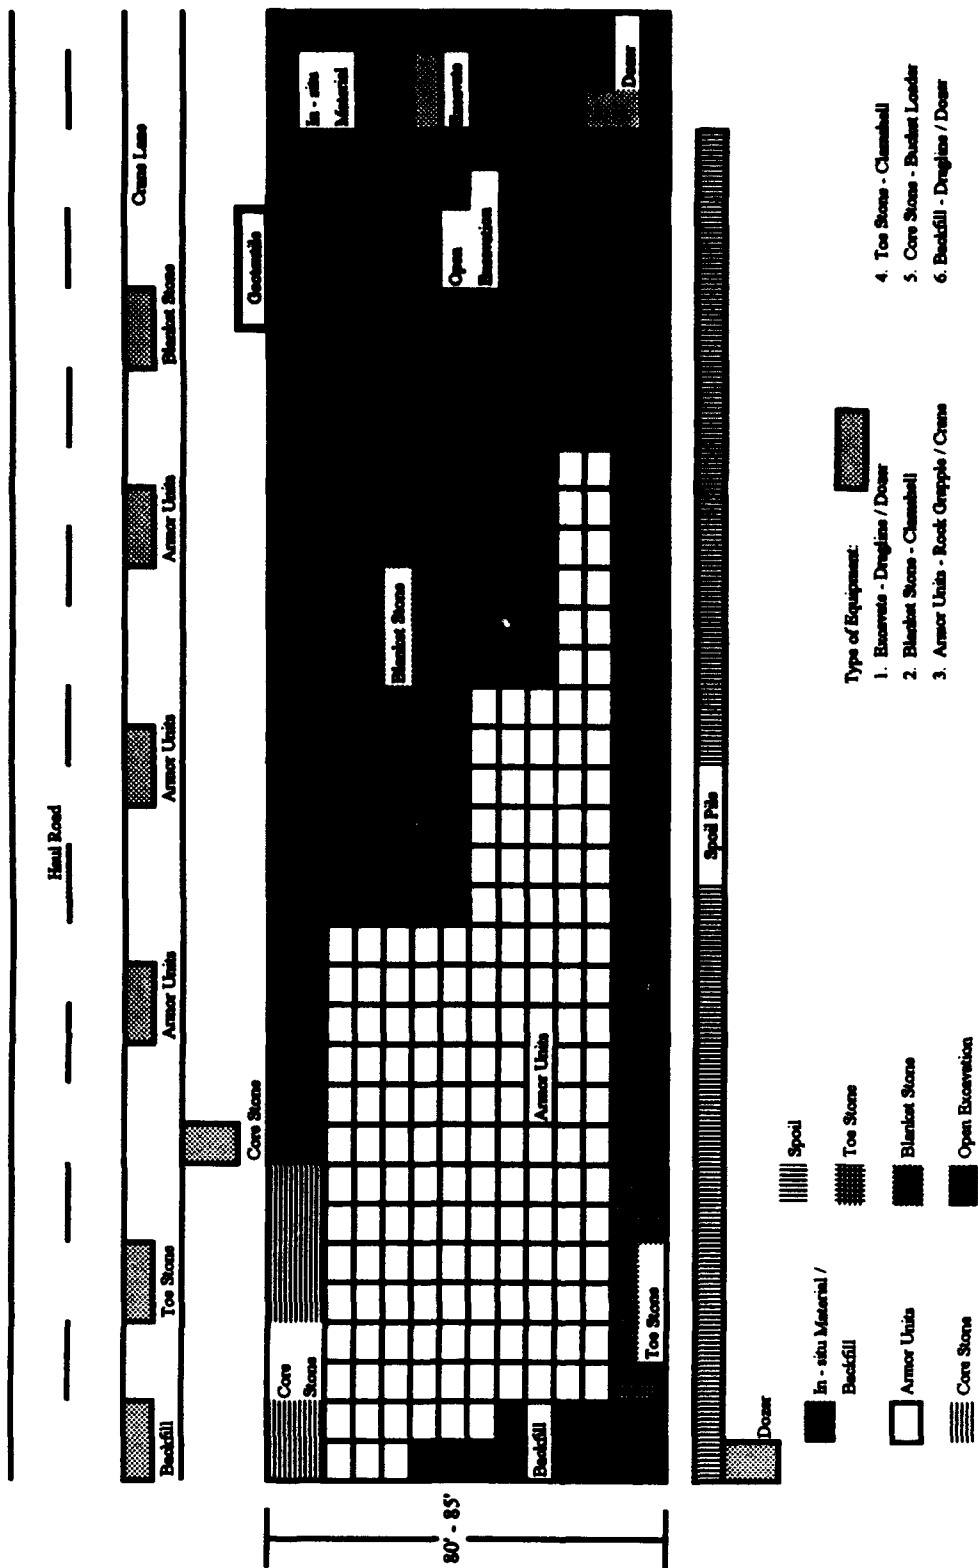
Workface Layout - Typical 1V:2.5H Concrete Block Revetment
